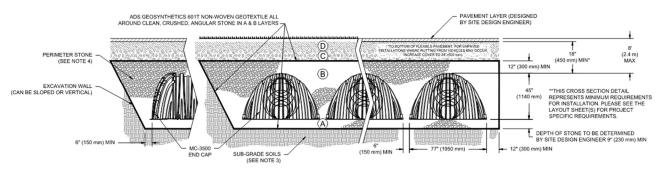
Typical Cross Section Detail through MC-3500 Tank
